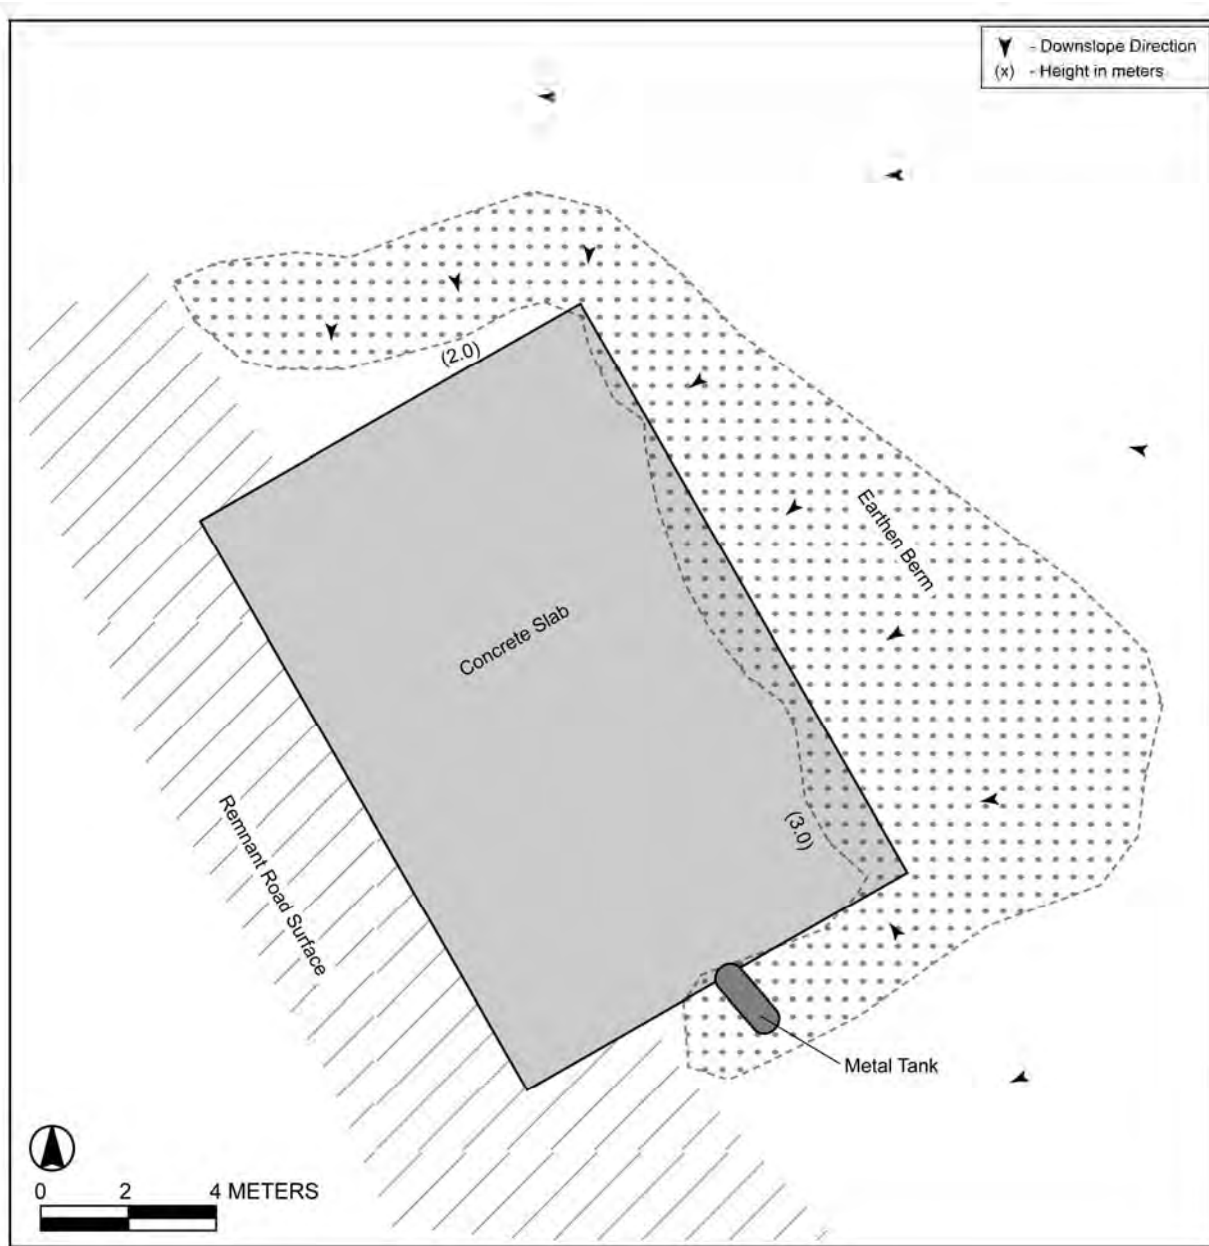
Plan-view diagram of SIHP # 50-80-09-7052 C concrete building foundation
